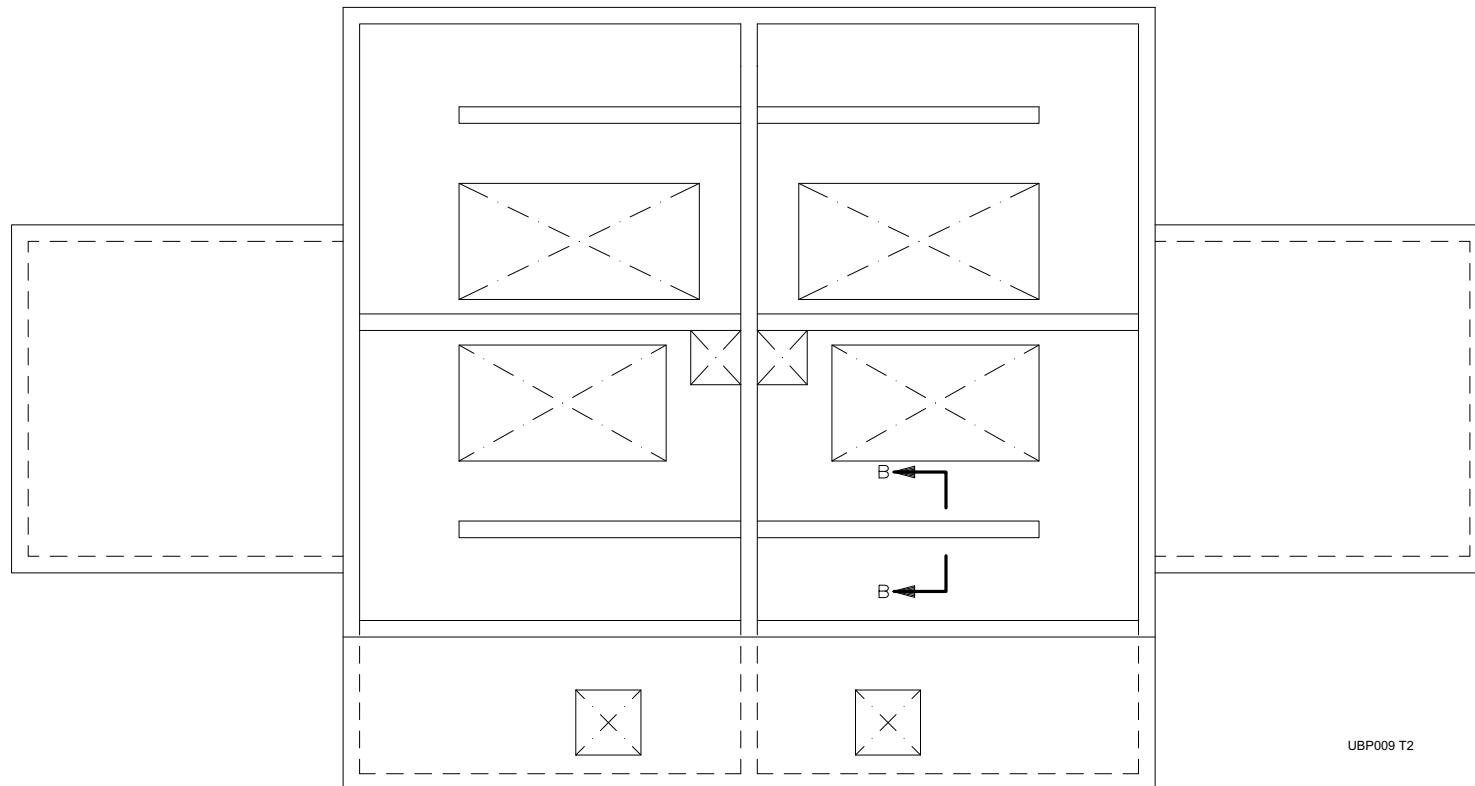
E.2-9—EPGB Slab at Elevation 51'-6"
